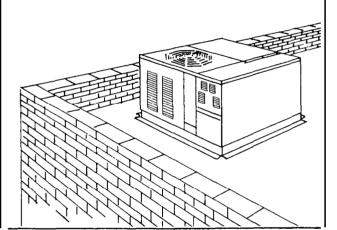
Flat Rooftop Installation, Attic or Drop Ceiling Distribution System. Mounted on Roofcurb.
